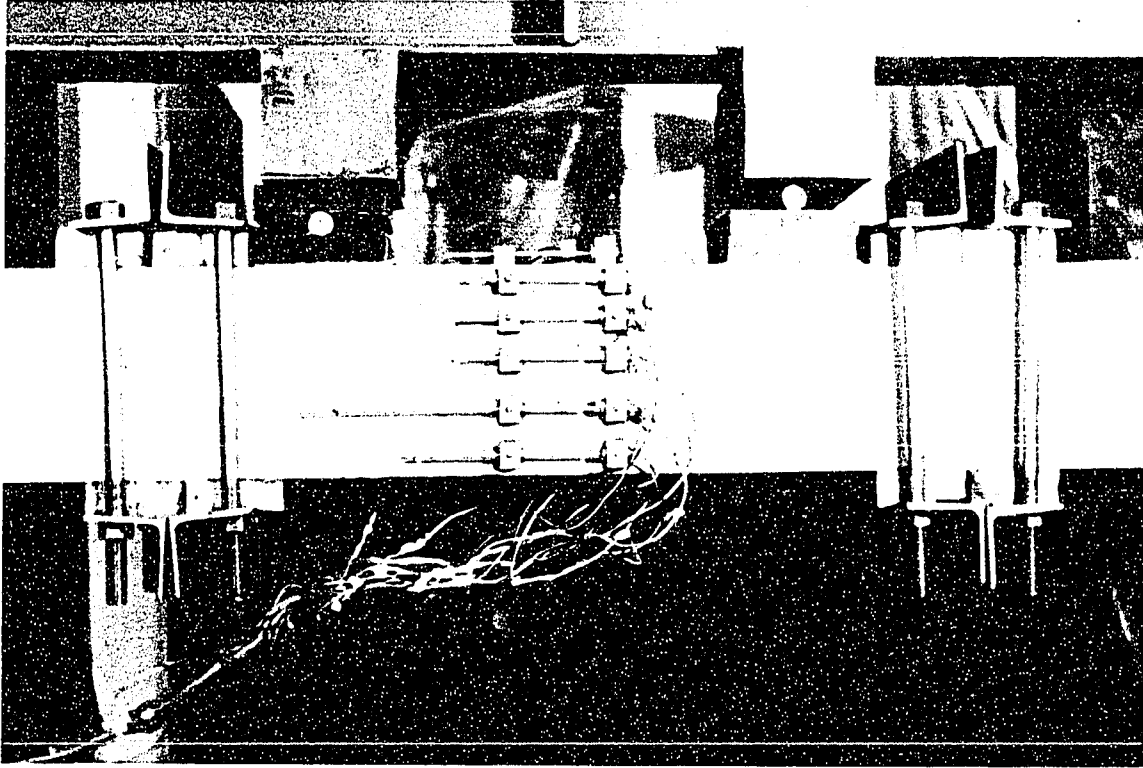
ARRANGEMENT OF EXTERNAL STIRRUPS, TRANSDUCERS AND LATERAL LOADING.
